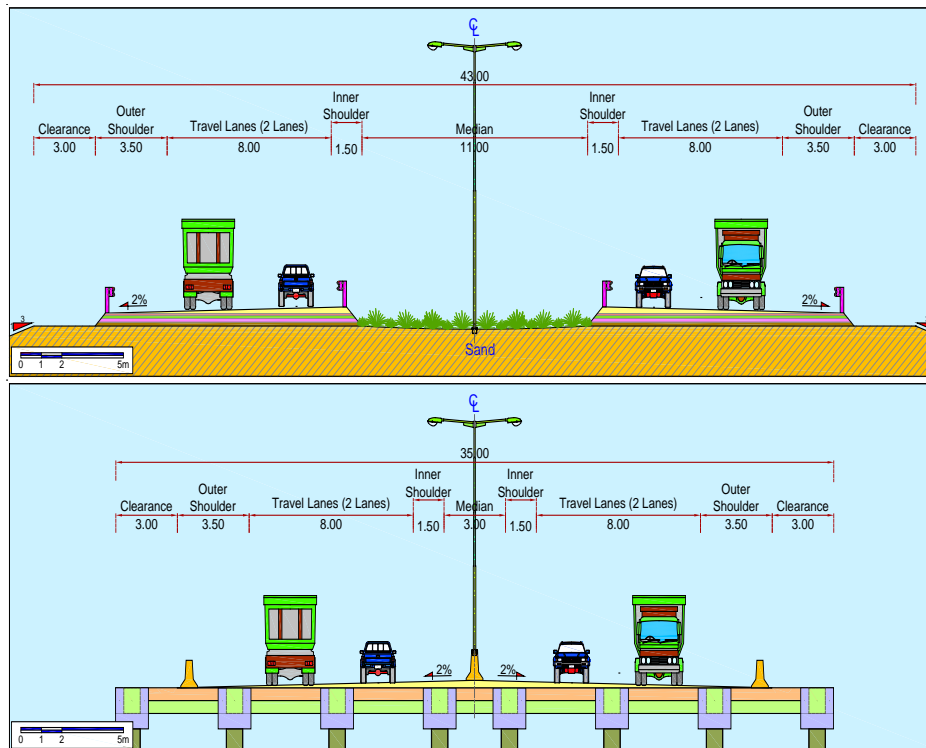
Cross-sectional views of the Semarang-Demak Toll Road for (a) Design Alternative 1 and 2, and (b) Design Alternative 3.
